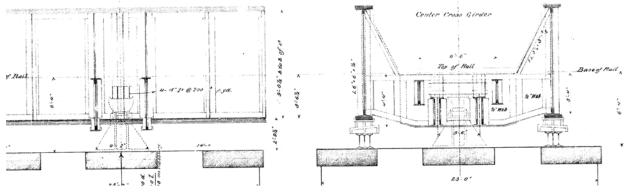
Elevation View of Center Support Assembly. Excerpt from 1890x Design Plans.
